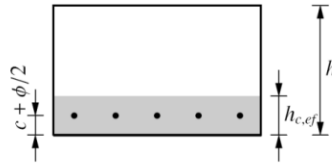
Effective area in a concrete slab for determination of crack spacing
